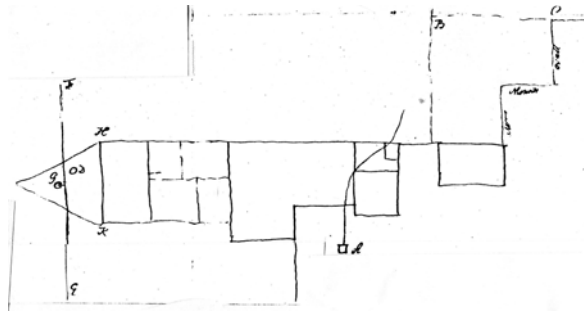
Plan of Drains at Cavendish's House. Cavendish's house faces Clapham Common at the bottom of the diagram. The separate building to the right is evidently a greenhouse, formerly containing an outhouse, which Cavendish refers to in his notes on experiments on air. To the left is a basin that becomes a pond, $7\frac{1}{2}$ feet deep, into which the drains from H and K run, and which is filled from the pipe EF, which probably comes from the pond across the road in the Common. G is the valve for letting water into the pond. The other letters stand for: A, a drain sink; B, the gate to the kitchen garden; BC, a drain running from Mrs. Mount's house to the right of what Cavendish has labeled Mrs. Mount's wall; D, a well formerly supplying the pantry or dairy. Water from A eventually runs into a ditch in the field behind the house, and from there it is conducted to the "lane," presumably Dragmire Lane, which bounds Cavendish's property. Next to the pond is a sundial, which Cavendish used as a marker in taking measurements of the basin. Cavendish refers to his walled "courtyard," but he does not indicate its location. This diagram was probably drawn up in connection with renovations Cavendish made before moving into the house in 1785. Cavendish Mss, Misc. Reproduced by permission of the Chatsworth Settlement Trustees.
